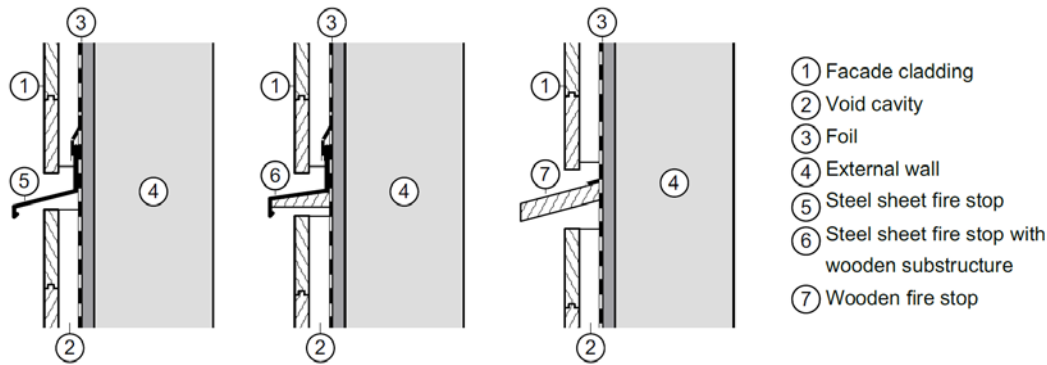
Schematic illustration of typical horizontal fire stops (projections)
